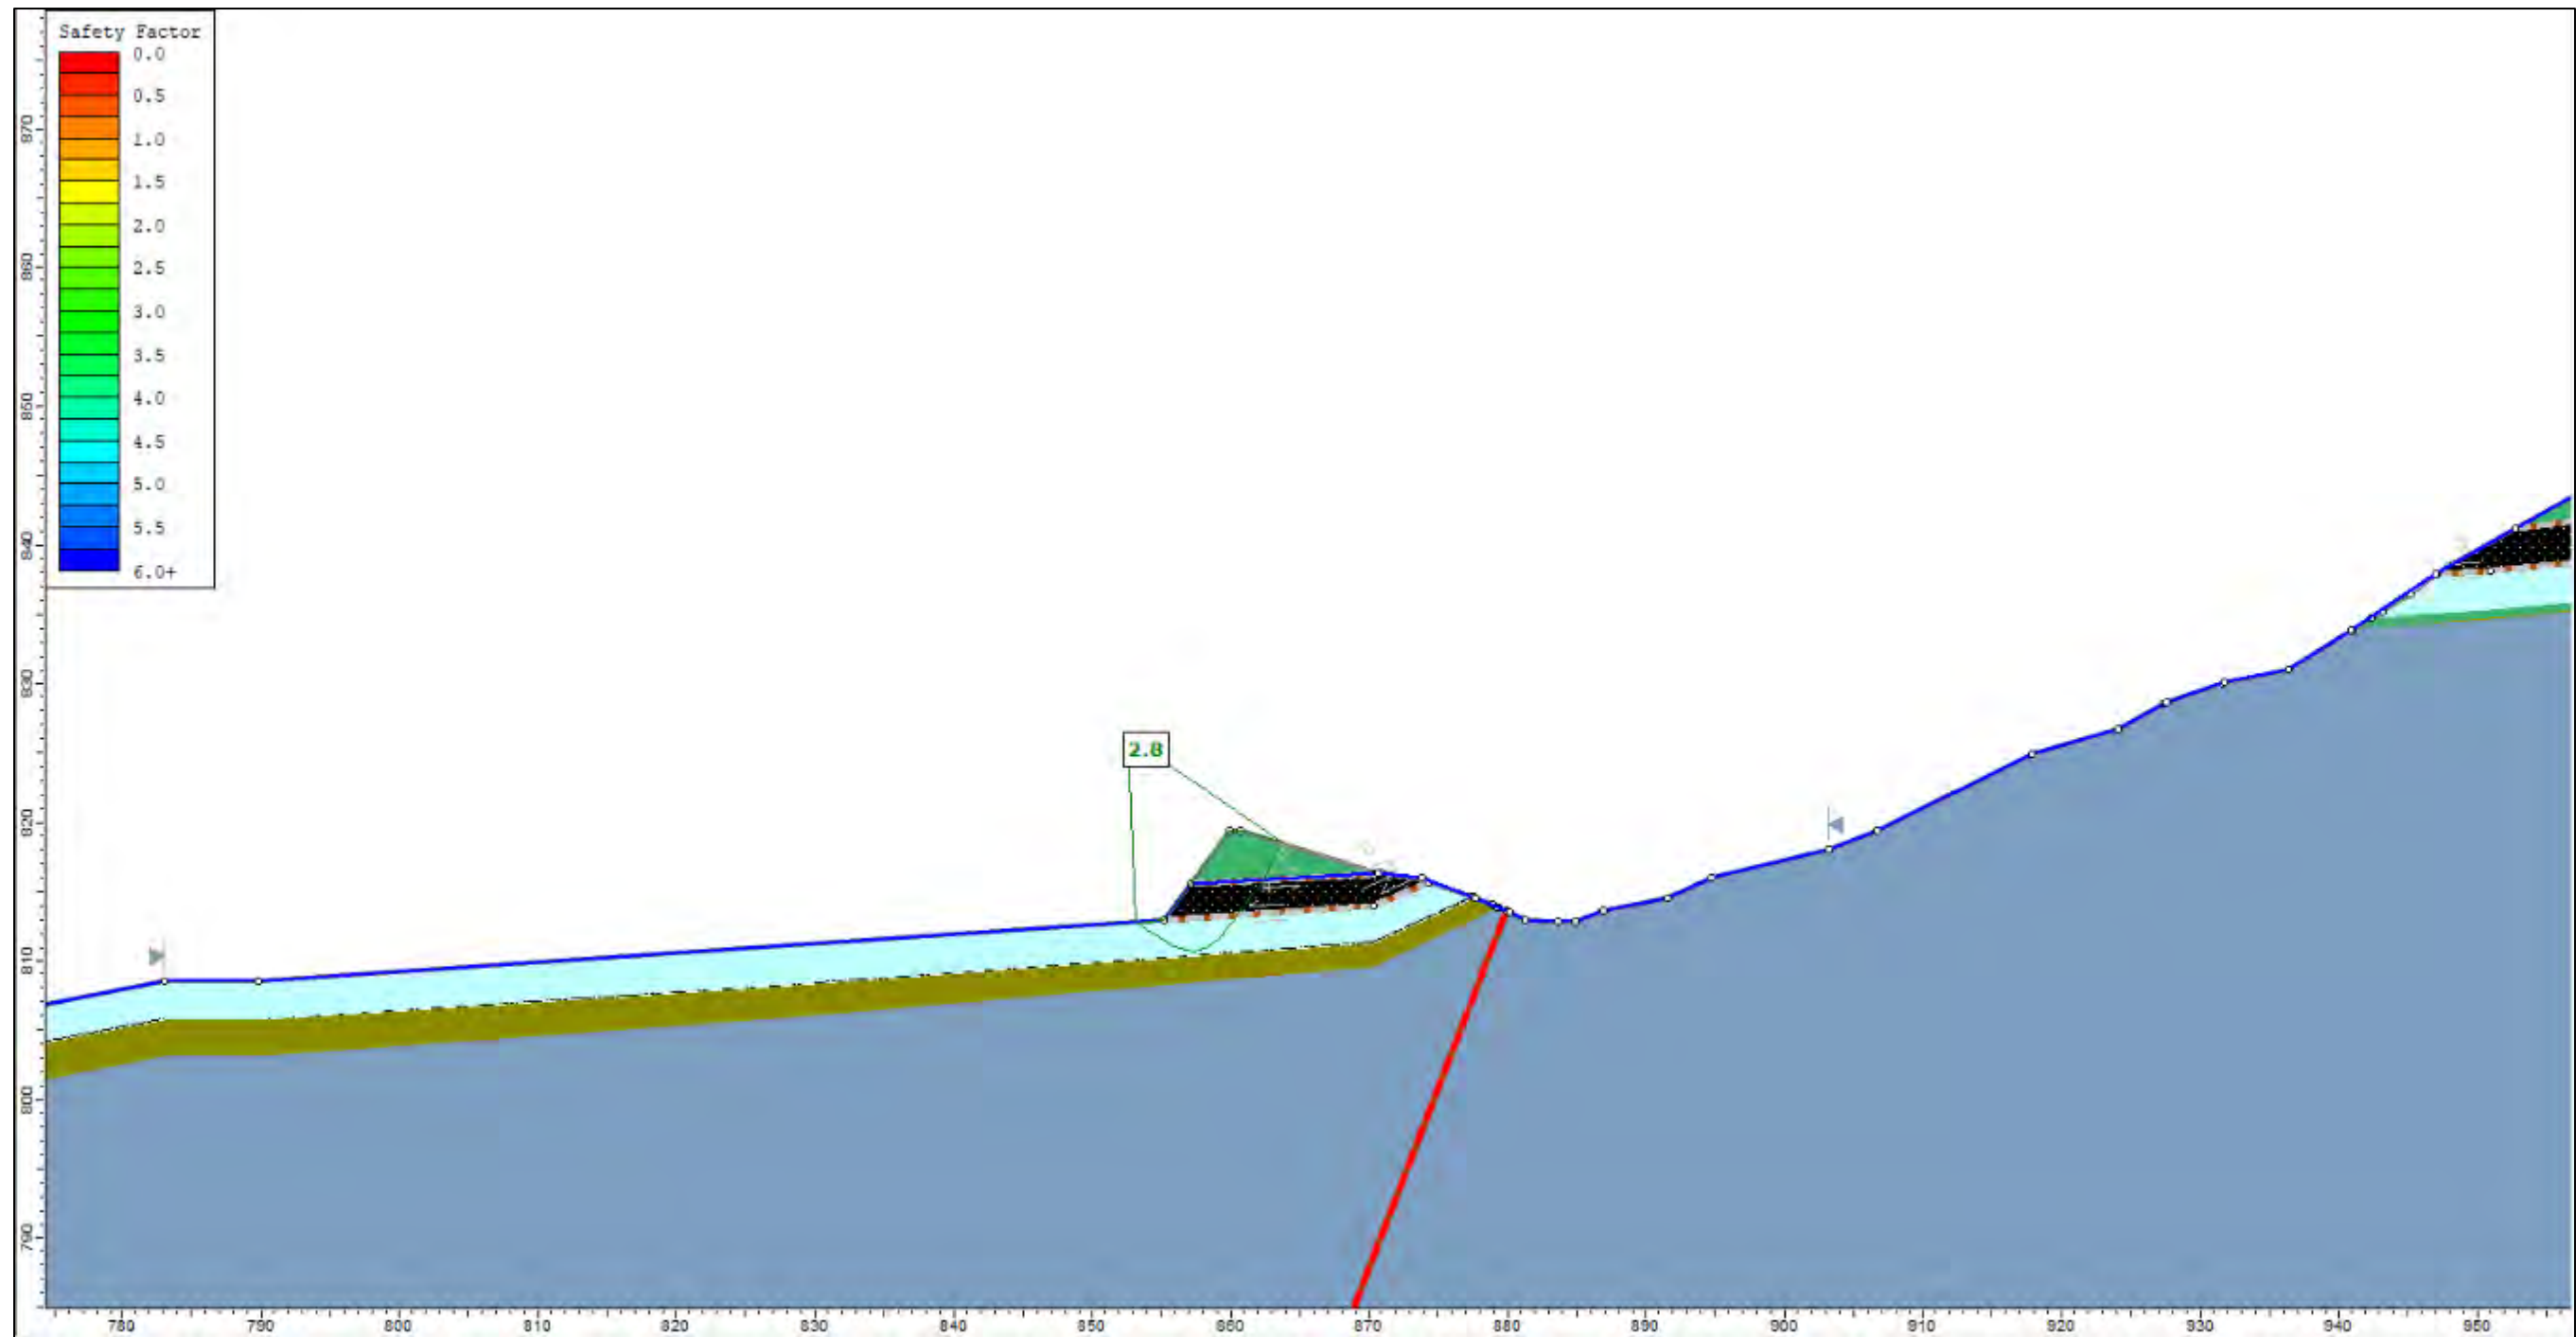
Slope Stability Analysis of East Pit South-Western Highwall– Section 102 – Elevated Groundwater Conditions.
